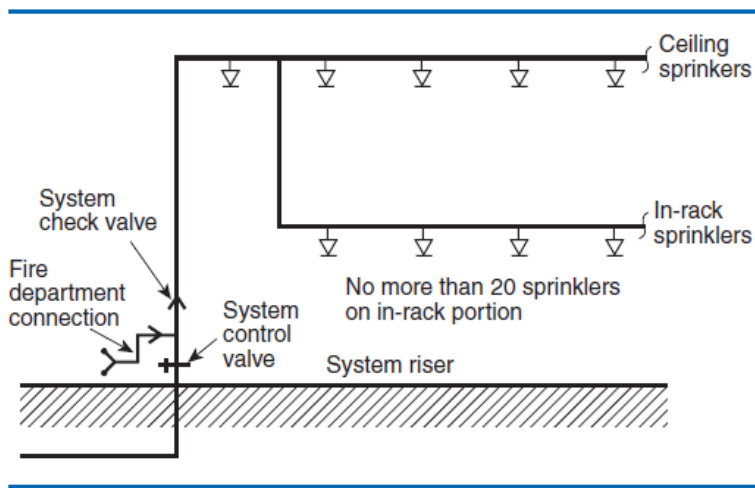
In-Rack Sprinklers Supplied Directly from Ceiling System Without Separate Control Valve.
